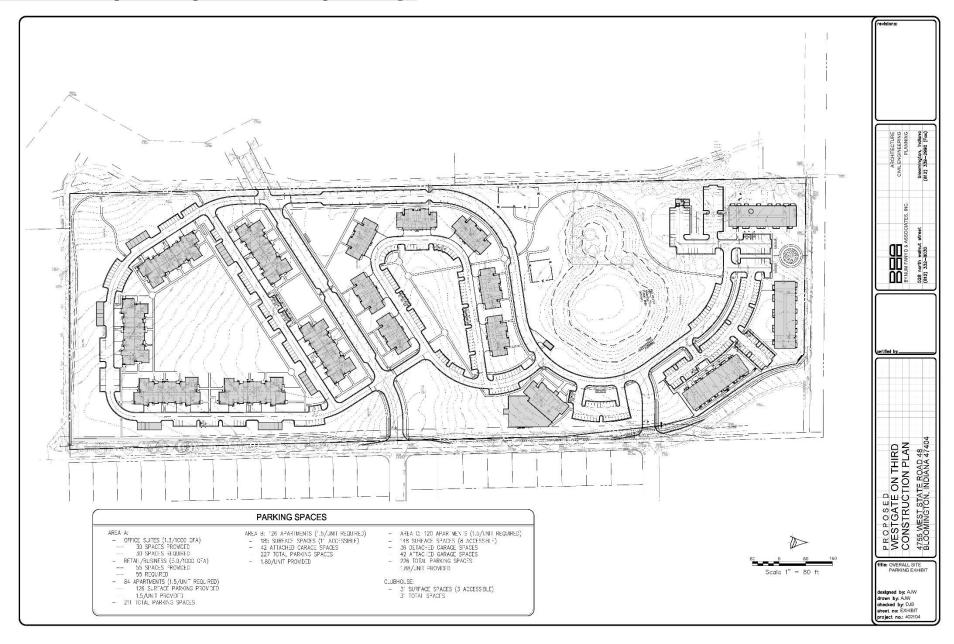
Proposed PUD Outline Plan (select pages)
